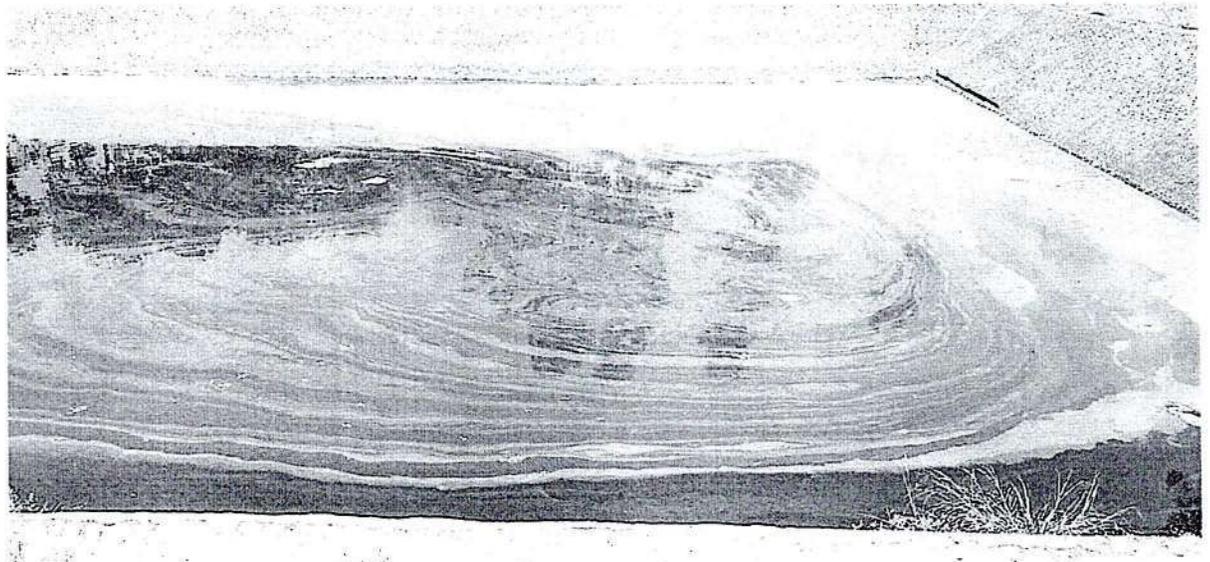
Photograph of newly constructed lagoon for storage of spent wash
